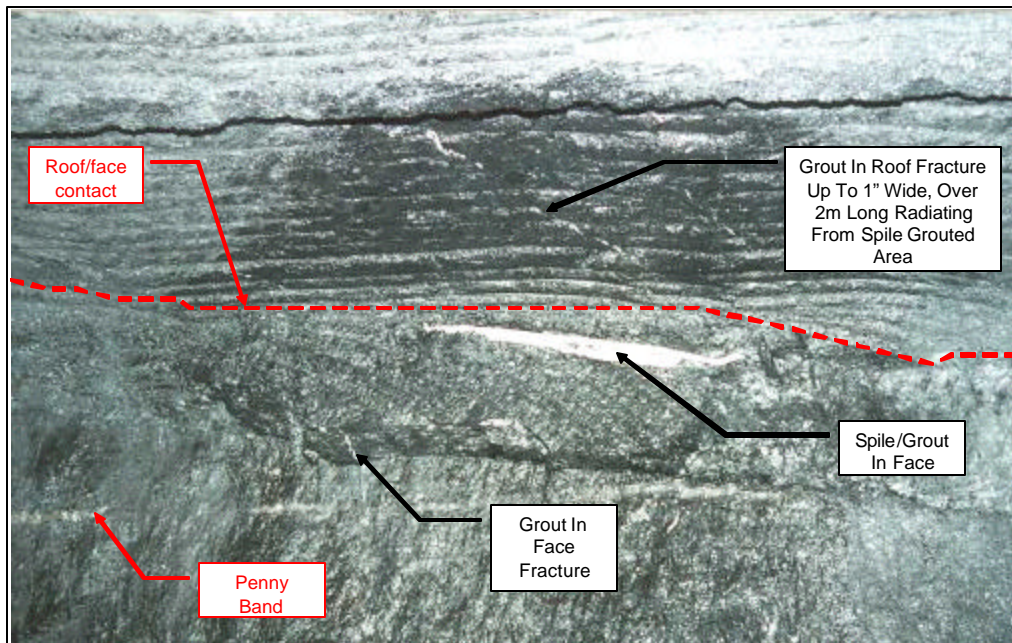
Grout permeation in face due to pressurized grout injection – LW103
